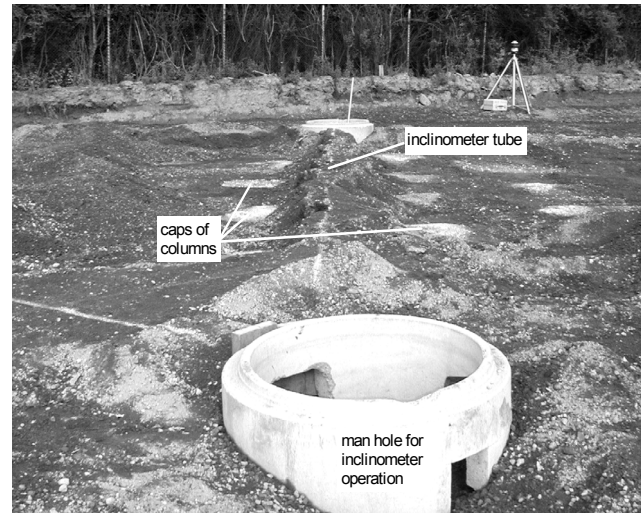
Test field under construction with caps of vibro concrete columns and tube between man holes for inclinometer operation
